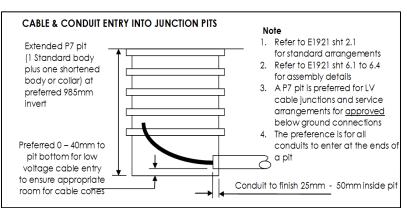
Typical Cable and Conduit Entry into Junction Pits
